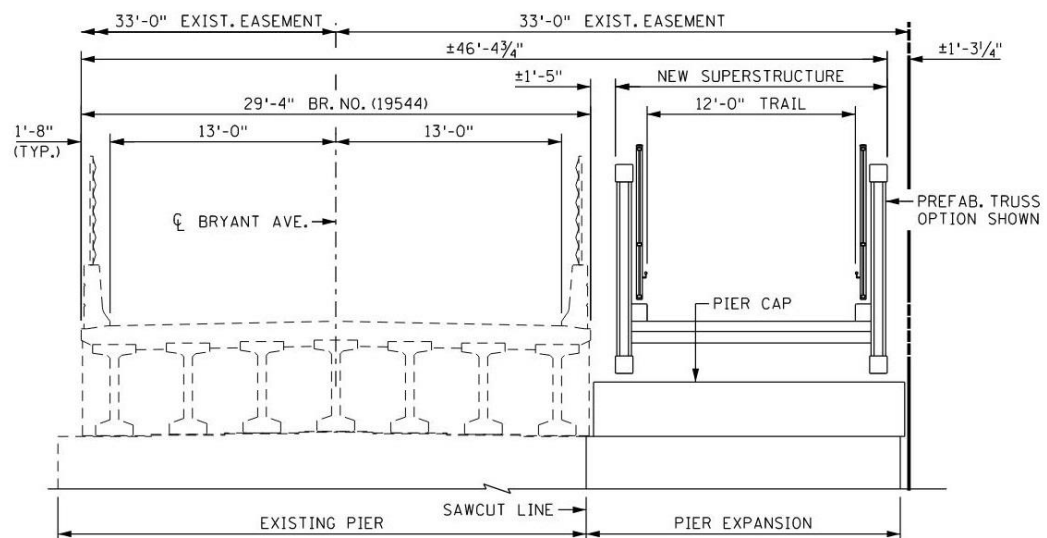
Recommended Bridge Alternative 1 with Prefabricated Steel Truss
